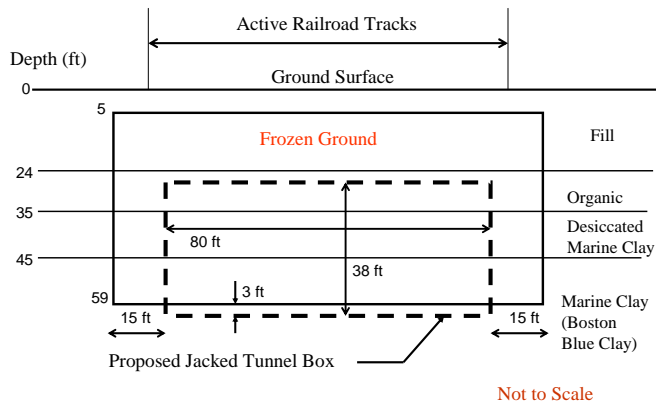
Typical Cross Section Showing the Frozen Ground Mass and Jacked Tunnel Box (1 ft = 0.305 m)
